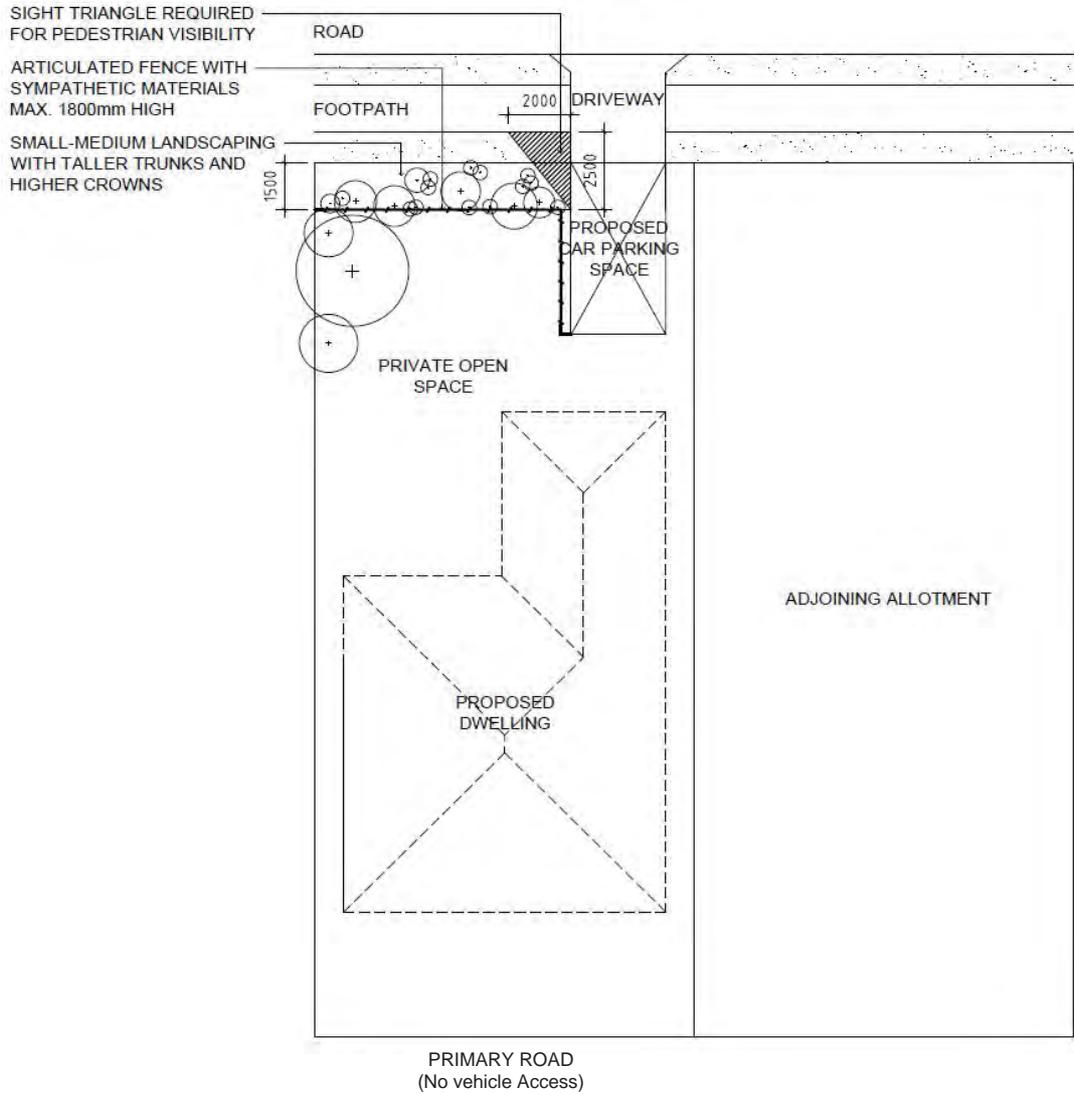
Sheaffes Road North Neighbourhood Plan
